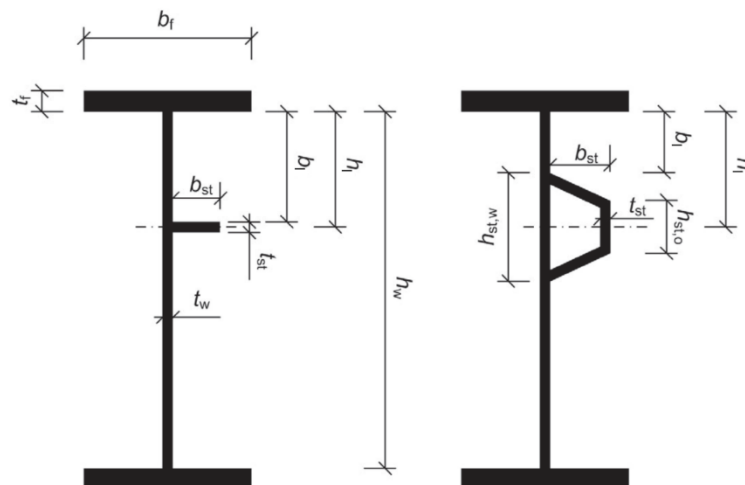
Schematic description for cross-sectional notations for a girder stiffened with an open section stiffener (left) and a closed section stiffener (right) [7, p. 26].
